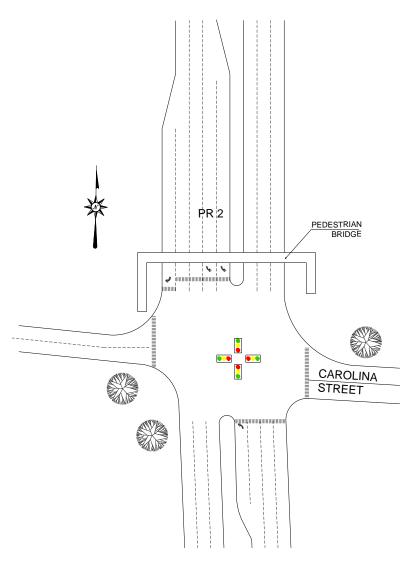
A: Plan view of the intersection PR2 and Carolina Street
